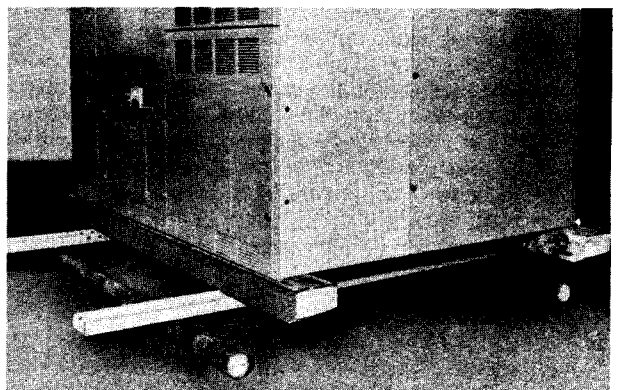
Jacks Removed and Switchgear Ready for Lateral Moving
